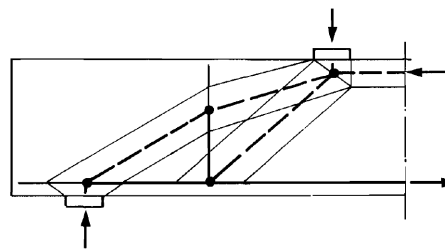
Combination of arch and truss effects in a detailed model of short shear span beams with stirrups as suggested by Regan [5-36].
